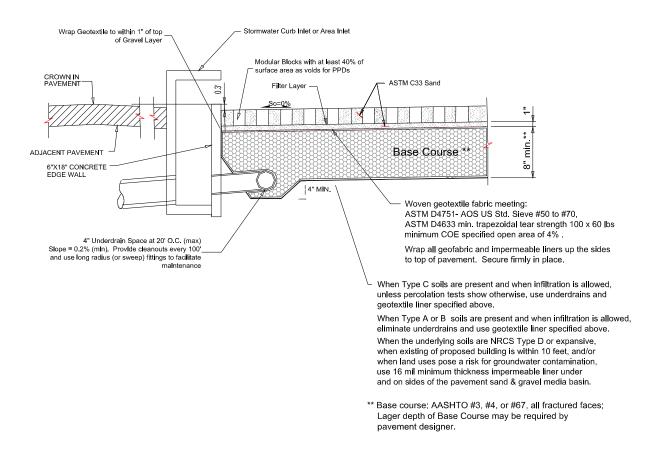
Porous Pavement Detention (PPD) – Typical Section
